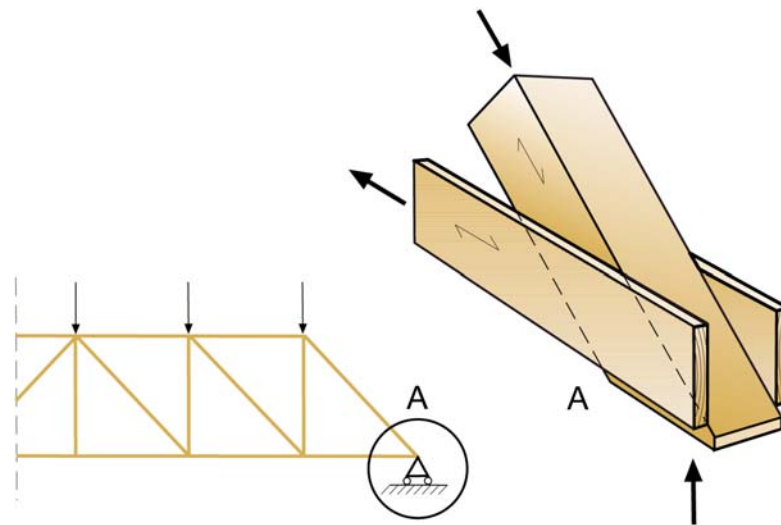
Part of a truss and a glued truss heal joint.
